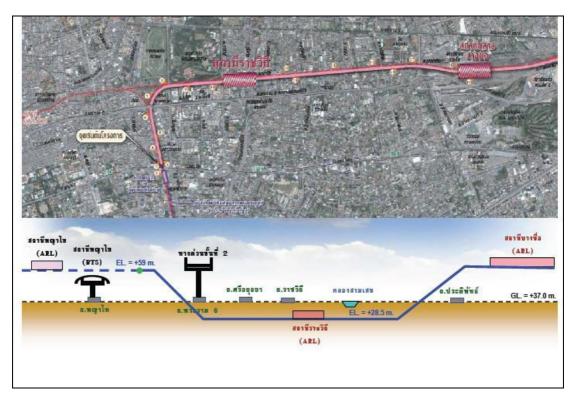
Plan and Profile of the Underground Section of The ARLEX
